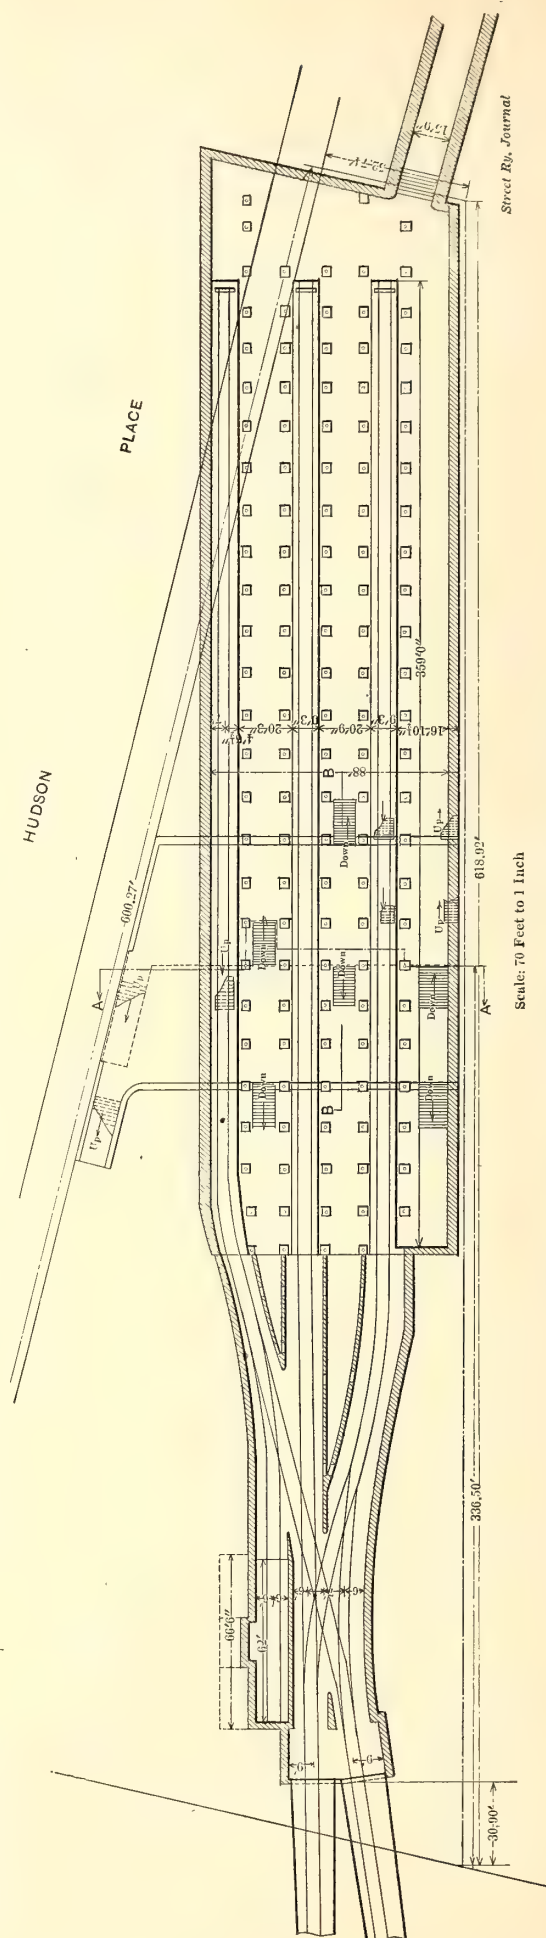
PLAN OF SUBWAY LEVEL, HOBOKEN TERMINAL
